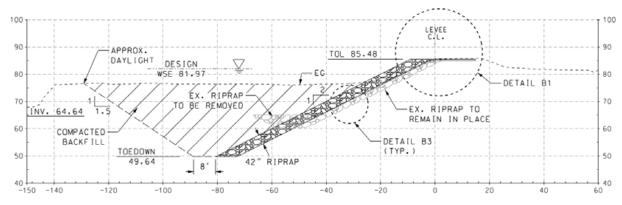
Typical Cross Section of Alternative 2, Loose Riprap for Design Flow (Sta. 270+00)
